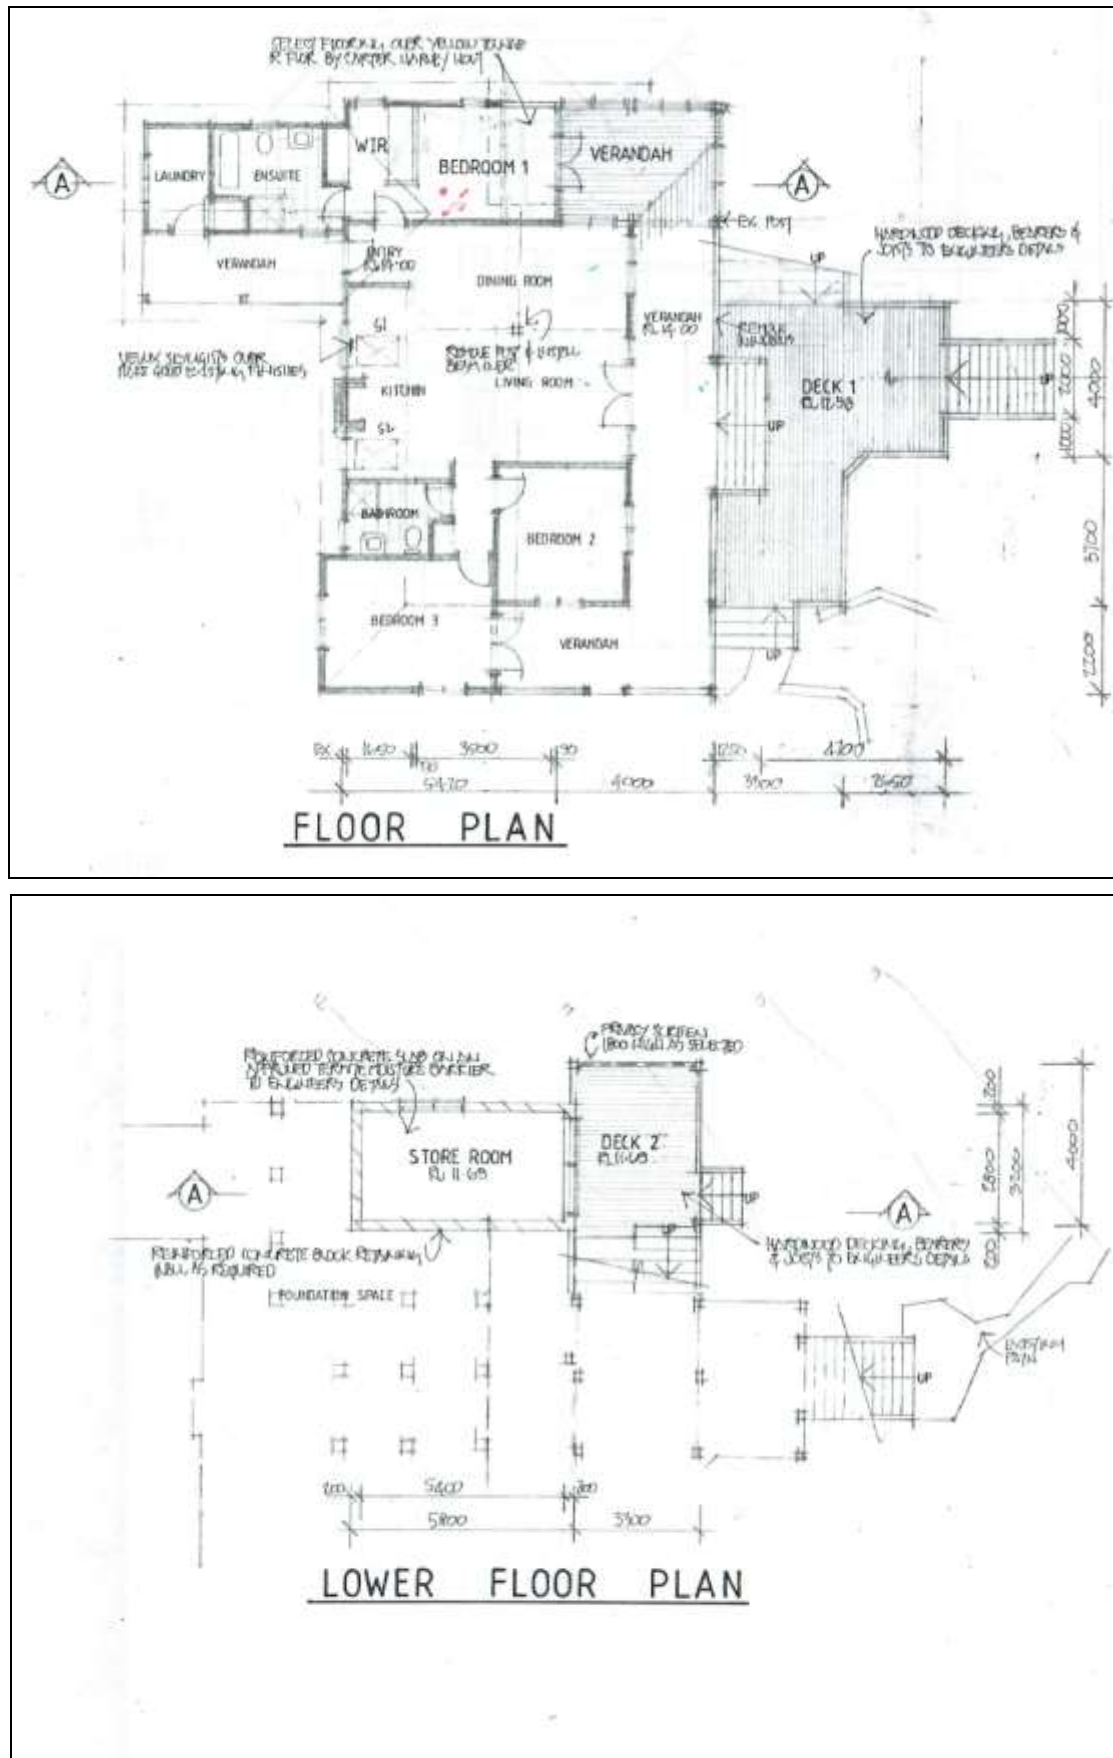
Above & previous page Illustrates the proposed works North/South Elevations & Floor plans for the residence. See page 13 for Garage/Home Office Elevations.
